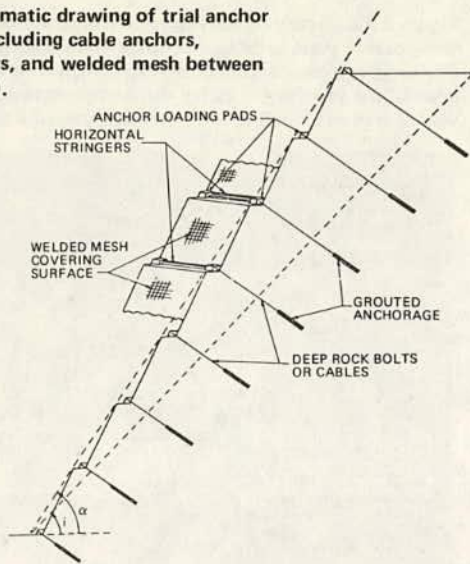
Schematic drawing of trial anchor support system including cable anchors, horizontal stringers, and welded mesh between anchor heads (9.4).
